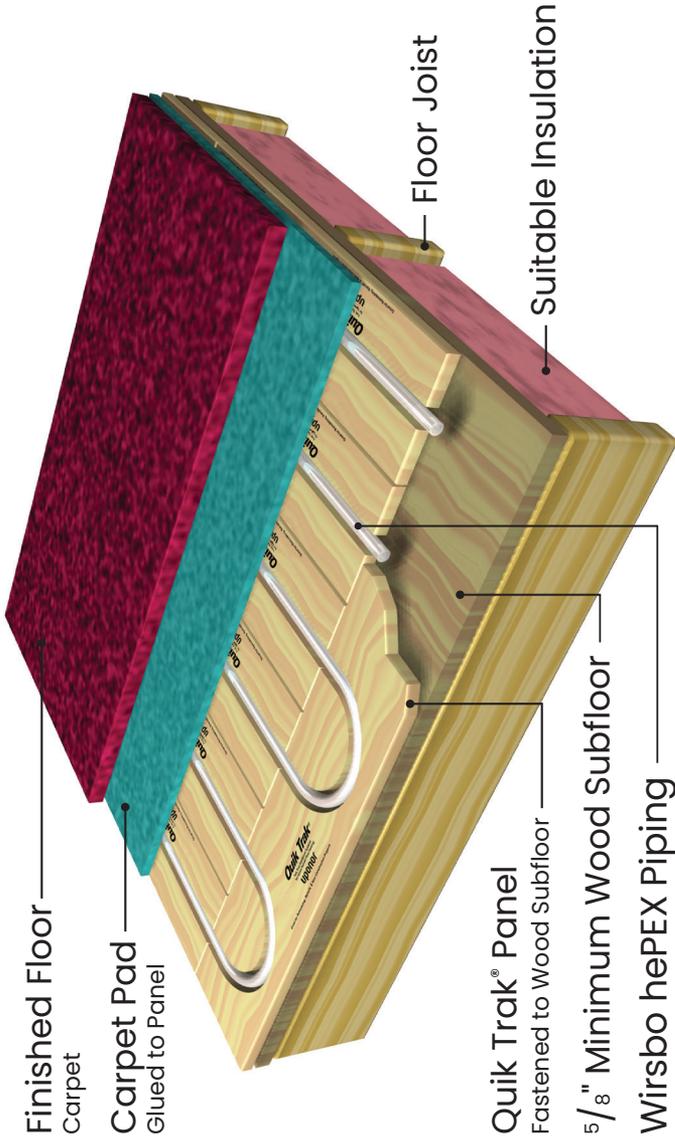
Quik Trak over a wood subfloor with carpet floor covering
